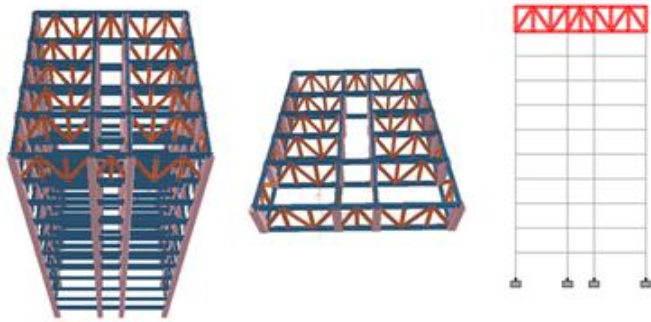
Steel Frame with Belt Truss and Outrigger Trusses (Model 2)
